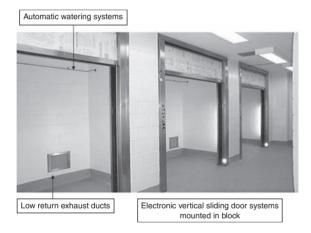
Built-in-place masonry block wall cubicles with open prefabricated vertical sliding doors that telescope up into the header.
